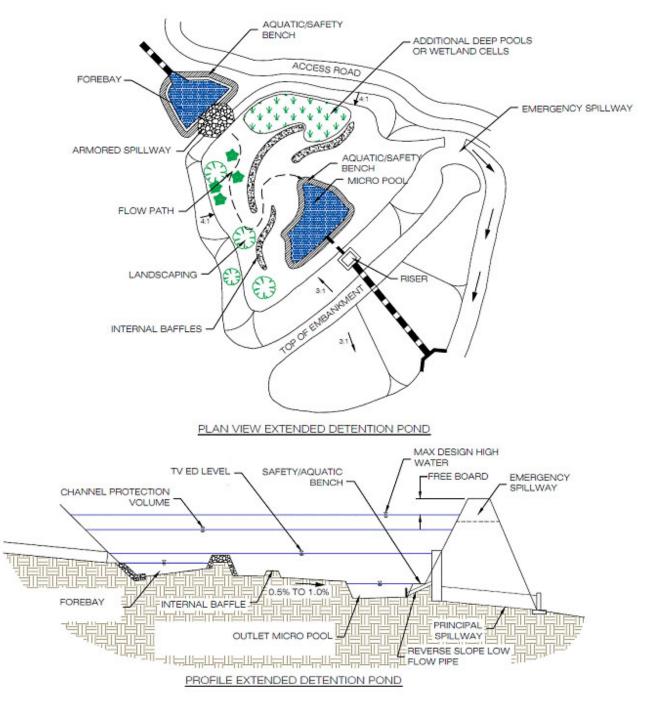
Typical Extended Detention Pond Details (source: VADCR, 2011)
